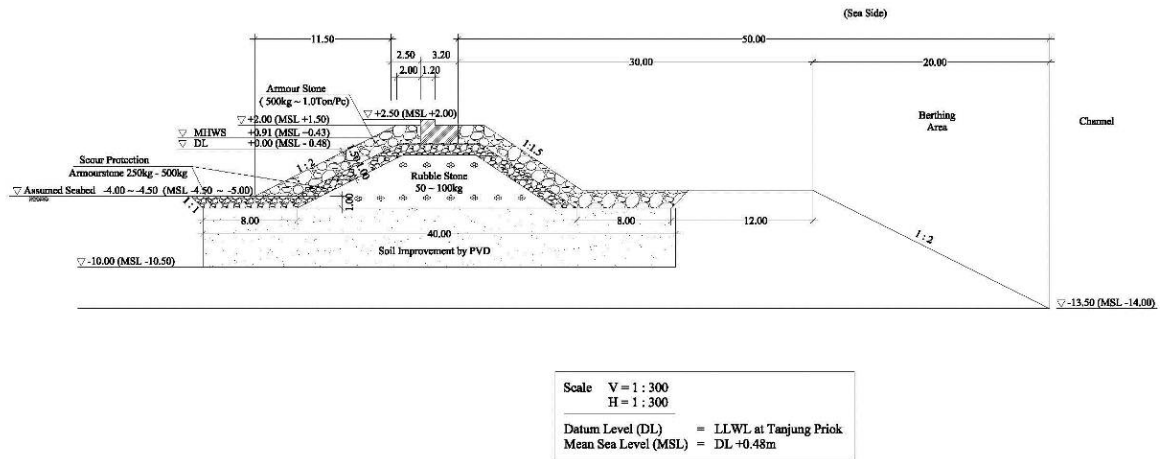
Typical Section of New Dam Citra Breakwater at North Kalibaru
